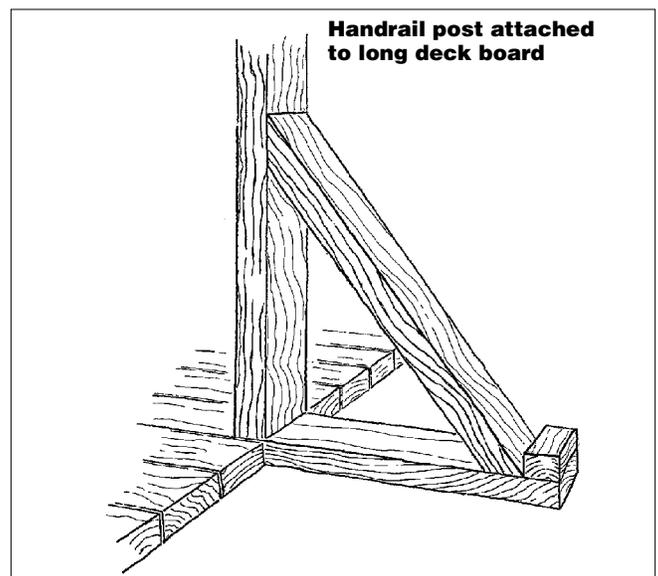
Attaching the handrail post directly to the decking requires long deck pieces to support an angle brace.
